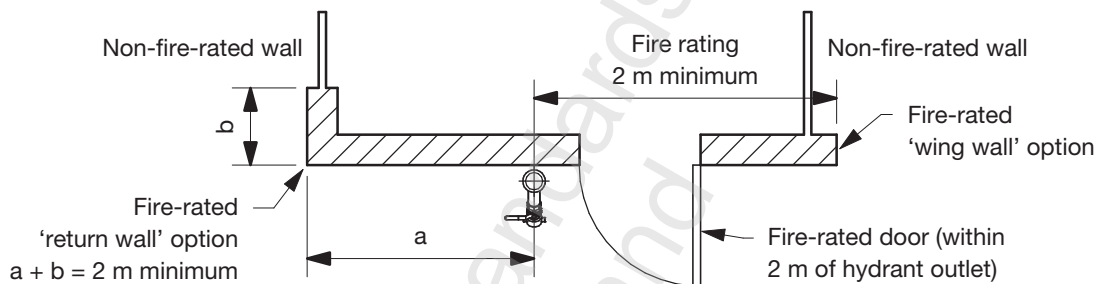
Unsprinklered building – Hydrant outlet protection – Fire rating options at building corners – Plan view
